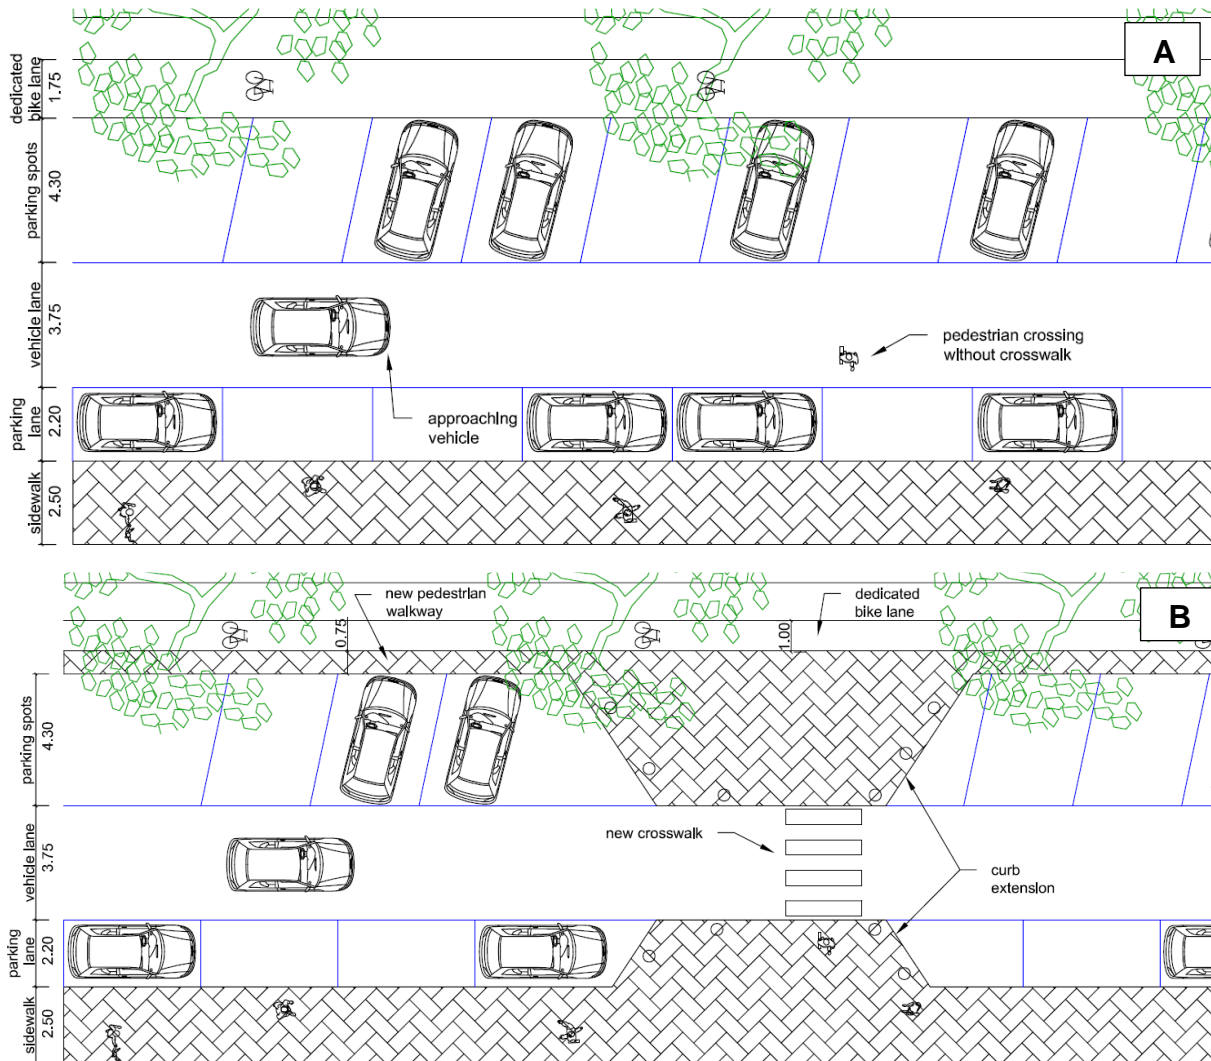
Segments between piazza Rivoli and piazza Adriano: (A) actual layout without mid-block crosswalk, (B) Proposed layout with mid-block crossing with curb extension and pedestrian walkway.
